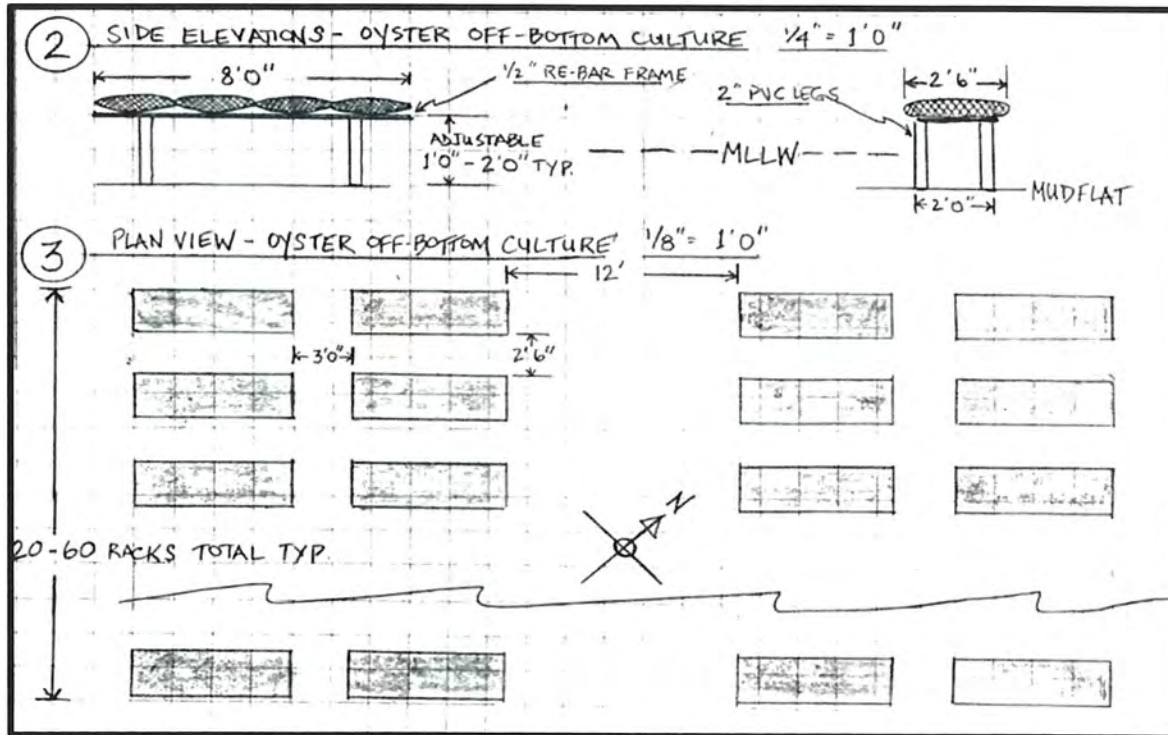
Typical Off-Bottom Racks-on-Pipe Layout
